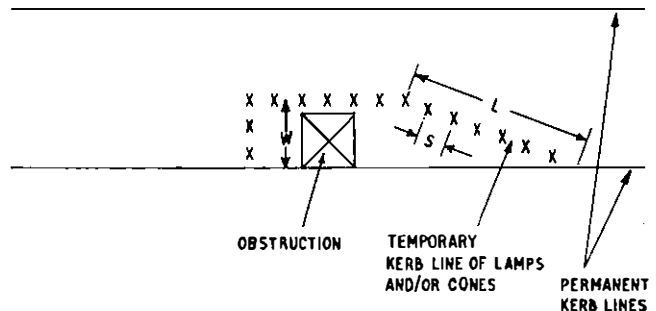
Diagram of typical layout of cones and/or lamps to form a temporary kerb-line round an obstruction.
